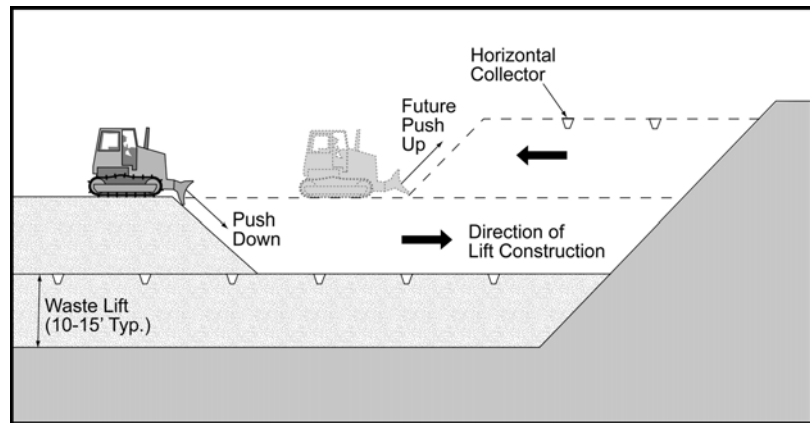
Lift Construction Method To Protect Horizontal Gas Collectors
